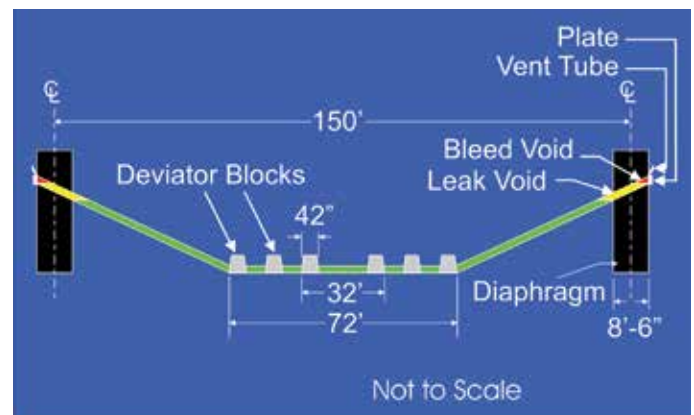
Typical Varina Enon span with draped tendon and bleed and leak voids. (Note: 1 ft = 0.305 m; 1 in. = 25.4 mm.)
